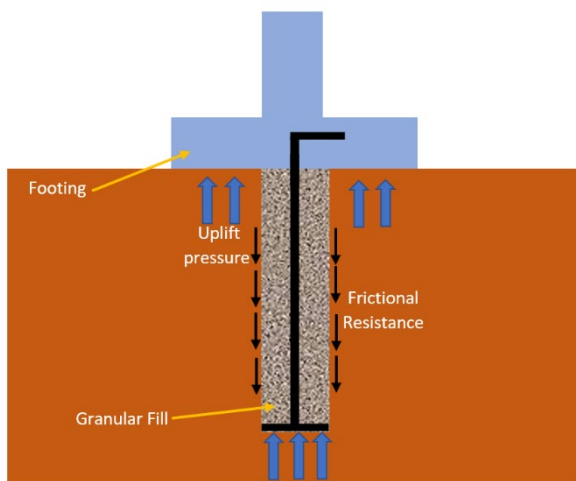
Schematic diagram of a granular pile anchored foundation in an expansive soil
